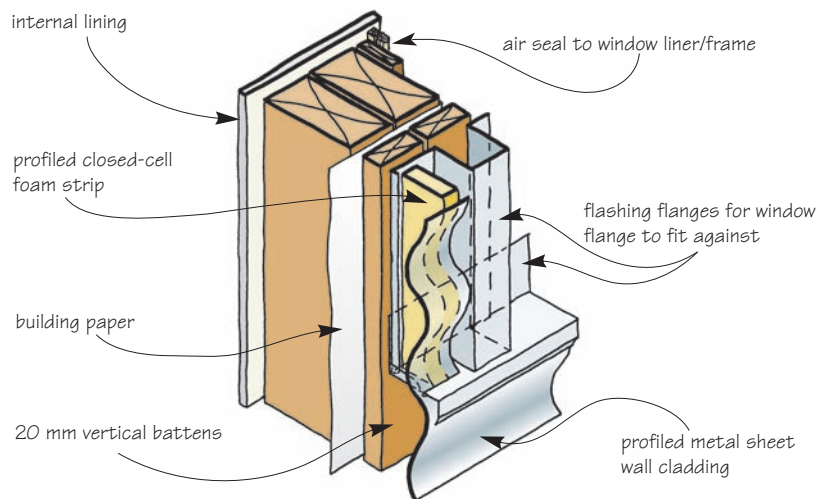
Horizontal profiled metal cladding with window flashing penetrating cladding.
